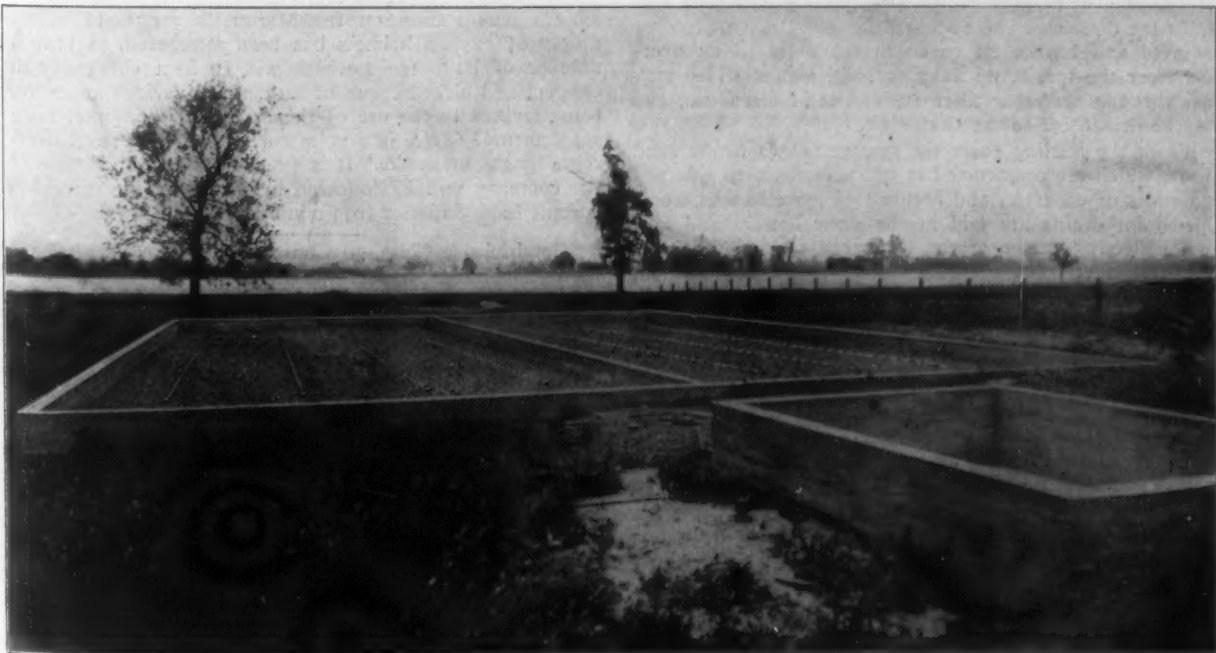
Sand Filters Under Construction, Showing the Broken Stone Bottom with Drain Pipes in Position—Settling Basin in Foreground.
